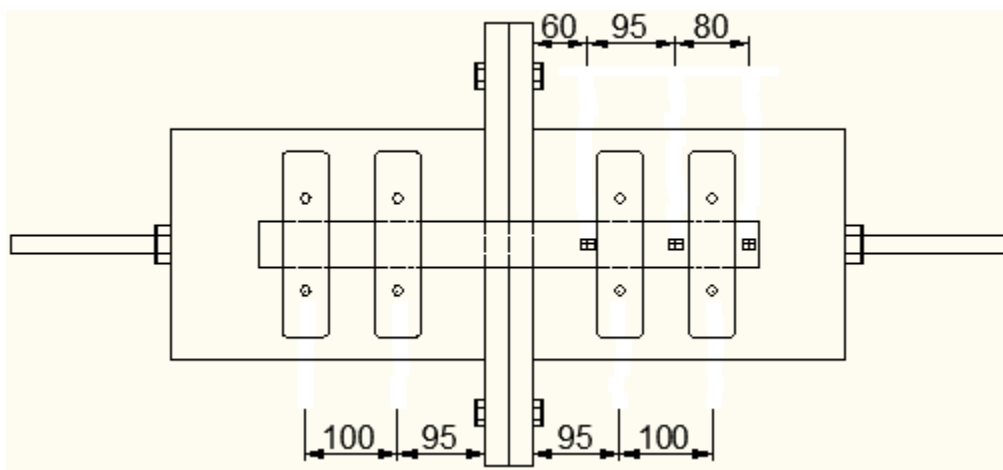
Location of strain gauges and anchors on specimen DS8 (north side)
